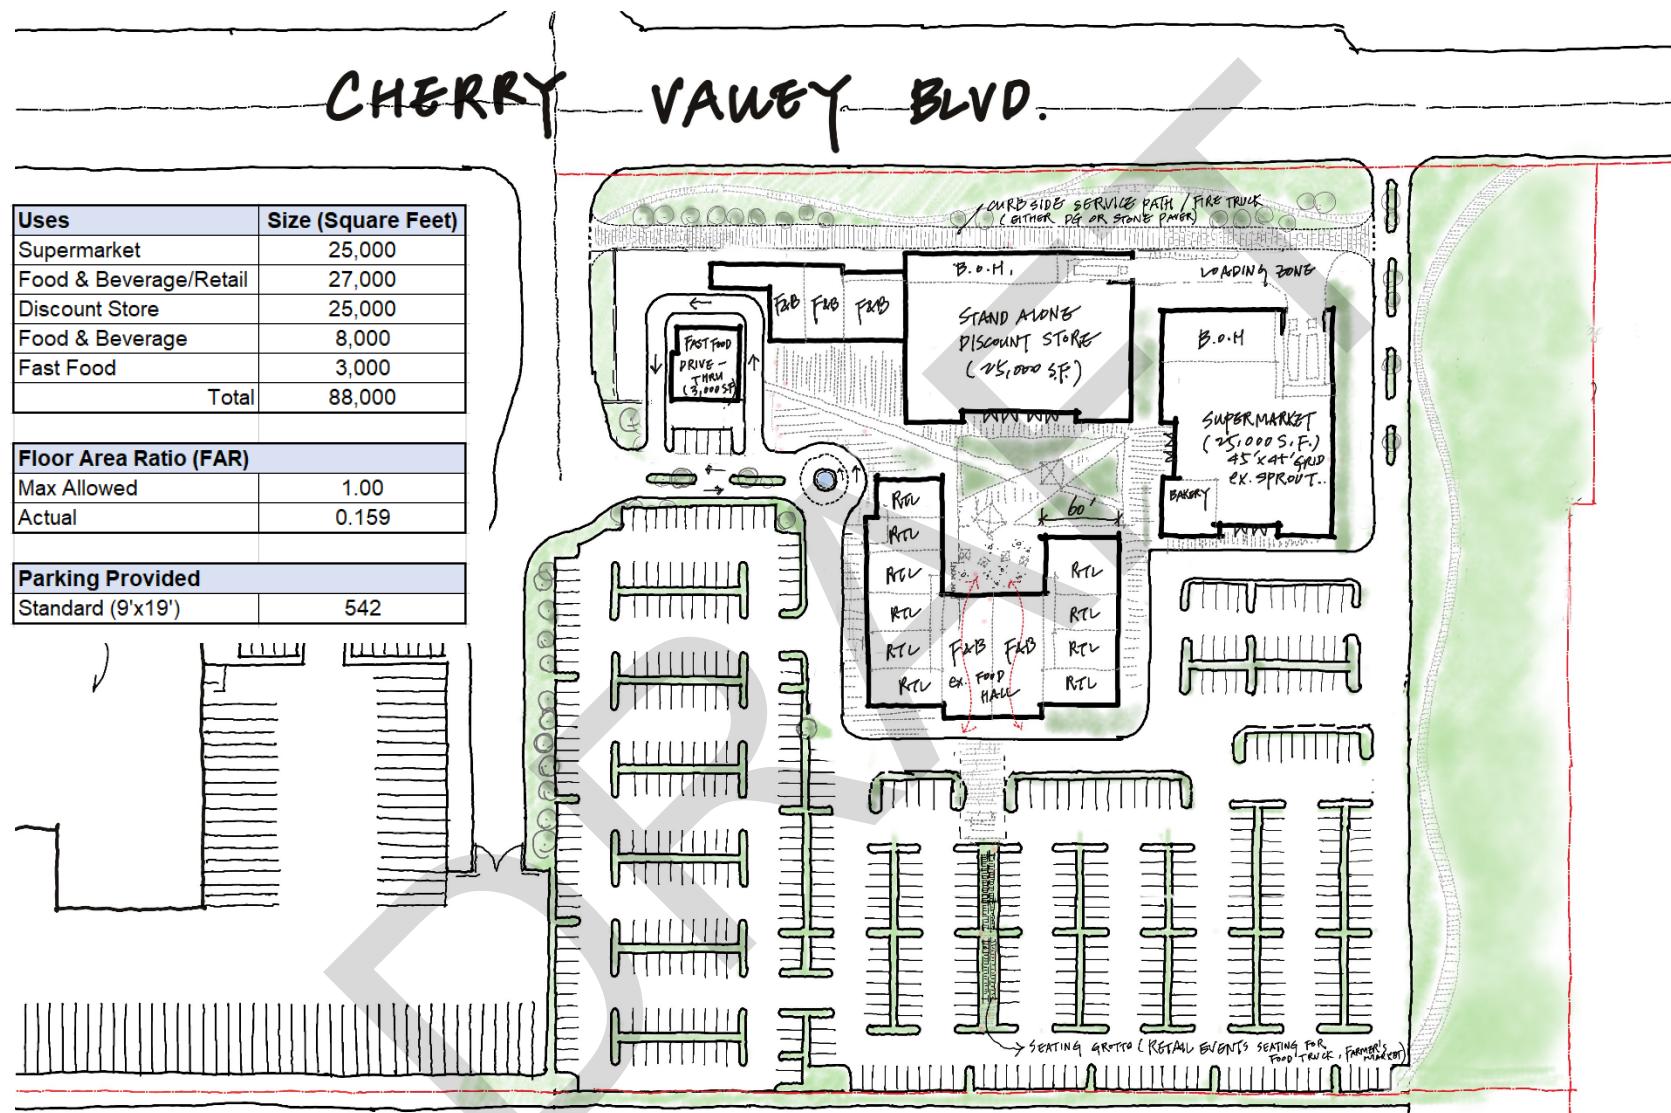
Commercial Planning Area Conceptual Site Plan - Scenario Option #3
